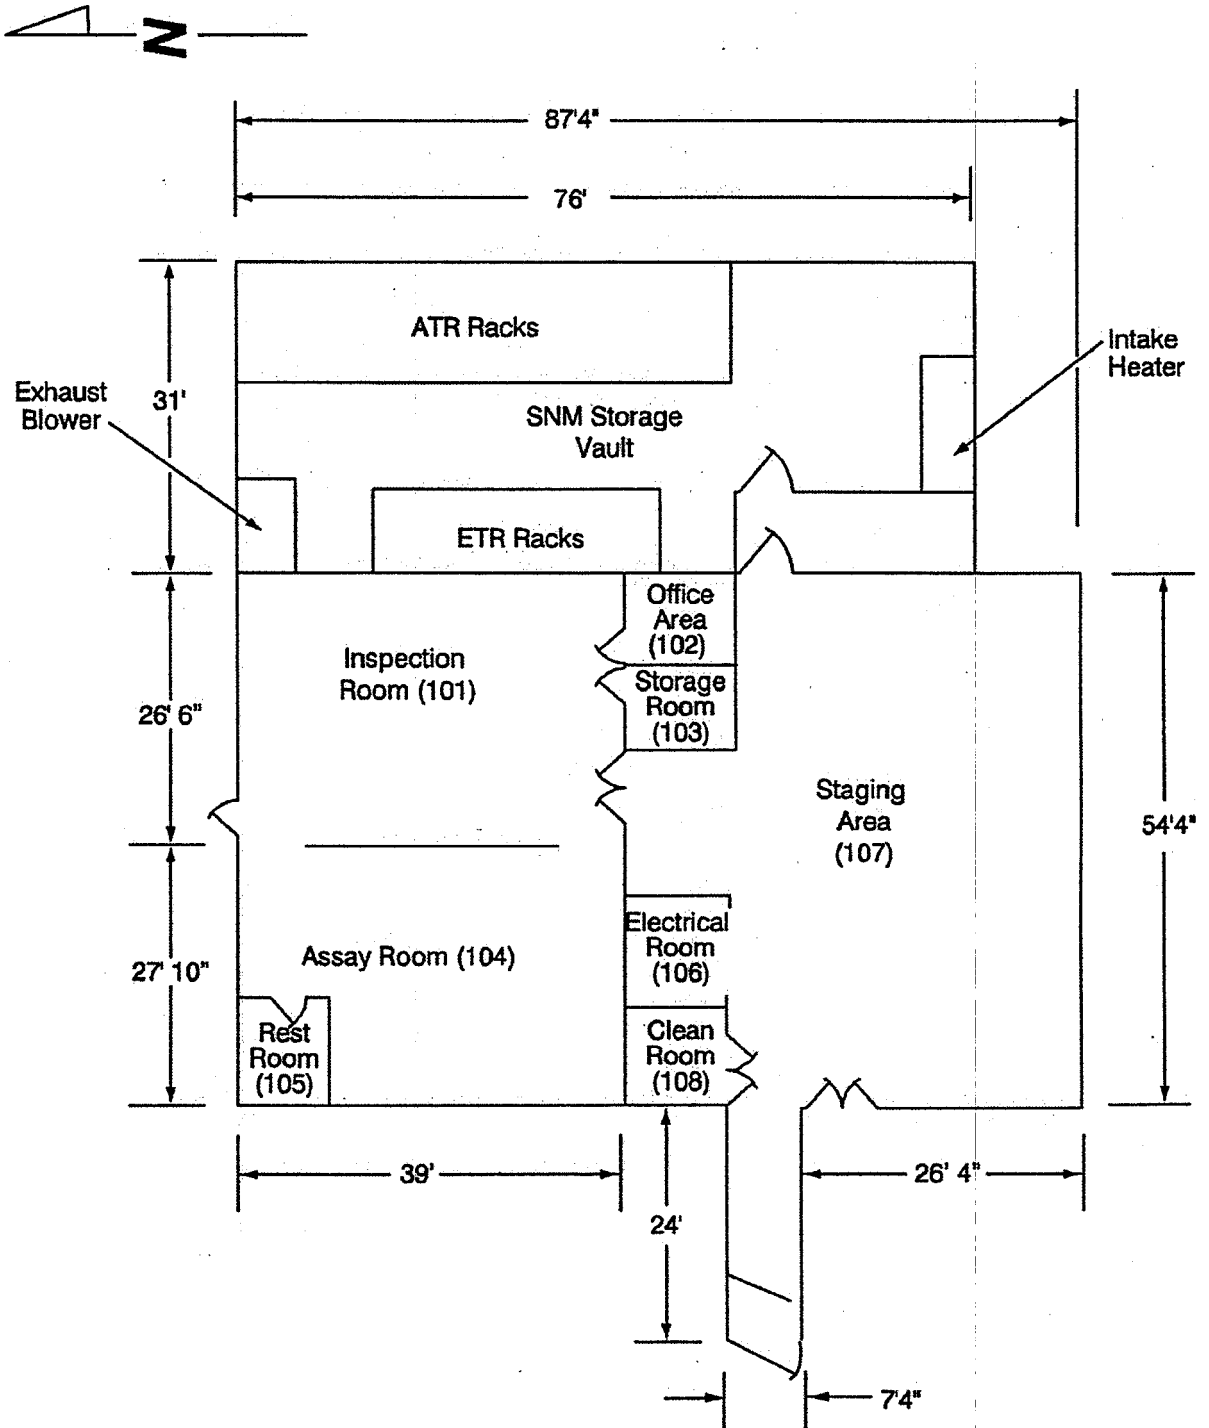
Floor plan for TRA-621, Nuclear Materials Inspection and Storage Facility.
